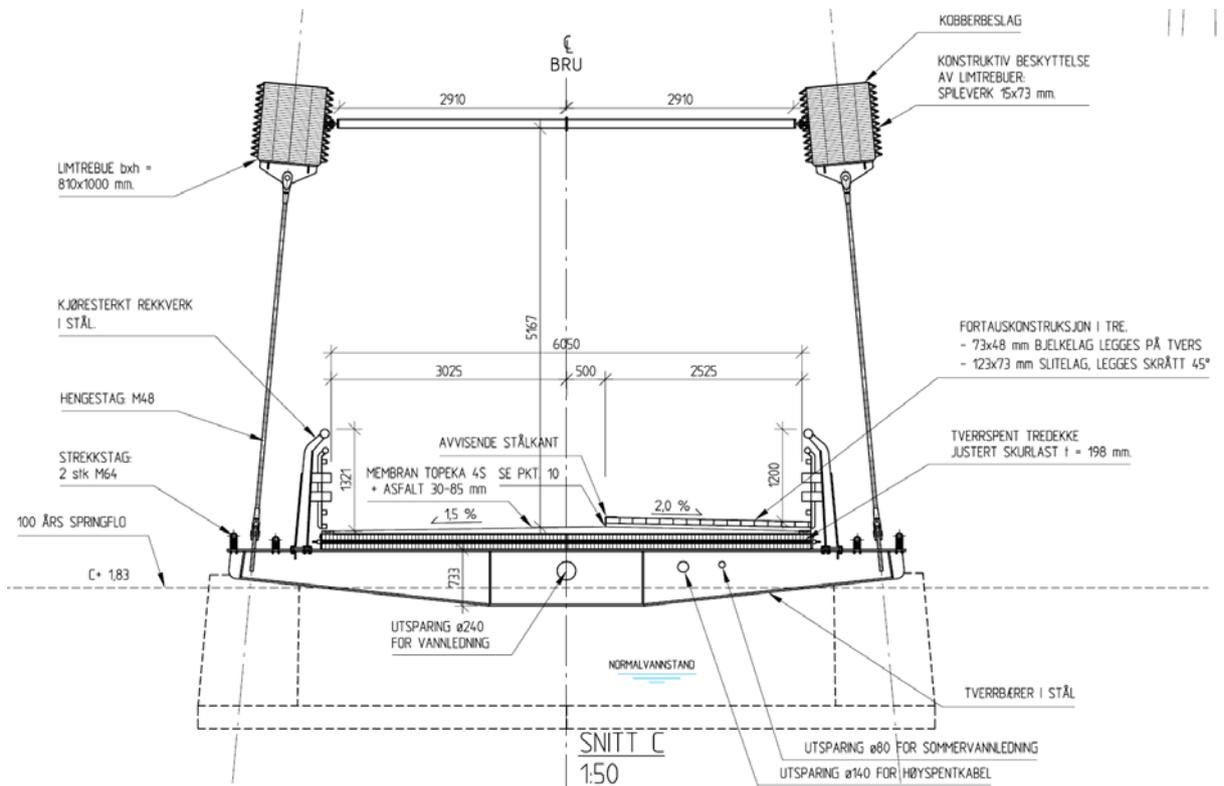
Fretheim Timber Arch Bridge has an effective bridge width of 6,05 m.
